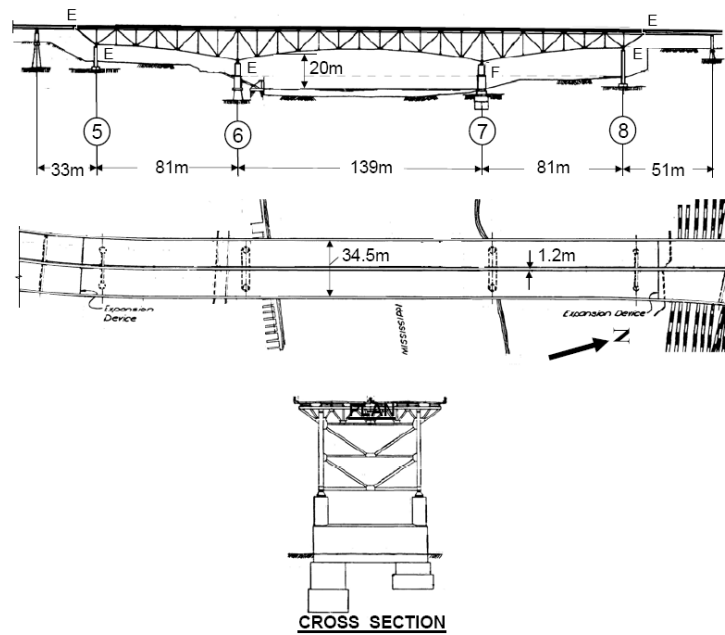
Structure of the I- 35W bridge (Astaneh-Asl,2008).
